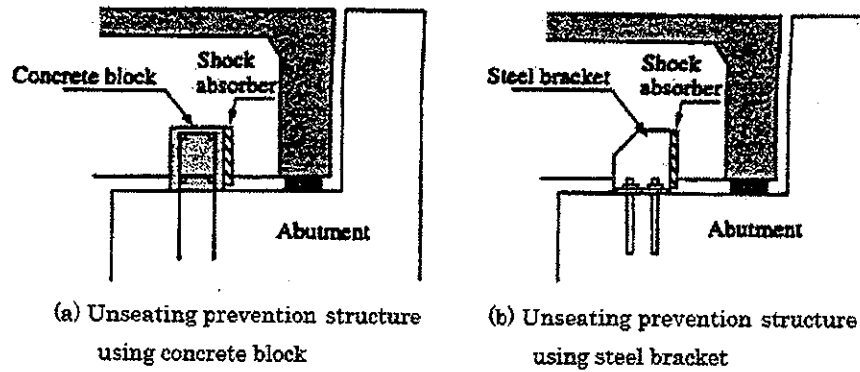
Examples of Unseating Prevention Structures Providing Protuberance on the Superstructure and the Substructure
